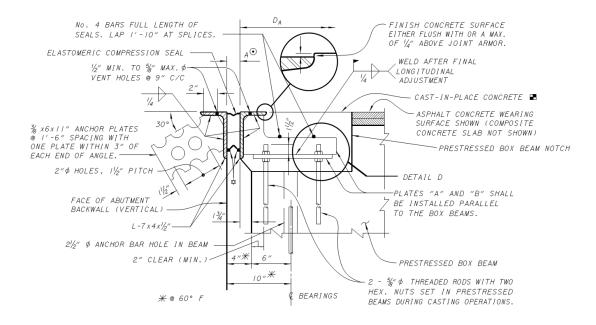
ODOT detail of compression seal joint (prestressed box beam bridge)
